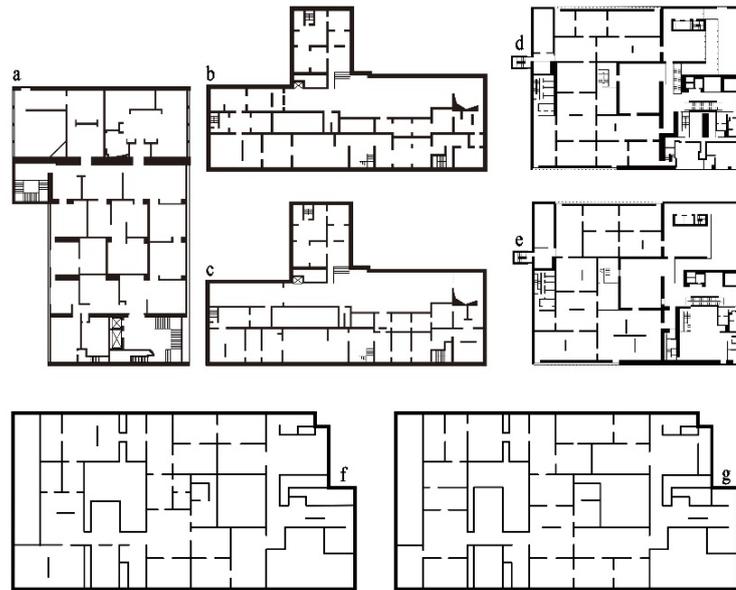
Floor plans of the MoMA. (a) 1967; (b) 1986; (c) 1996 ;(d) 2005 Fifth floor; (e) 2005 Forth floor; (f) 2019 Fourth floor ;(g) 2019 Fifth floor
